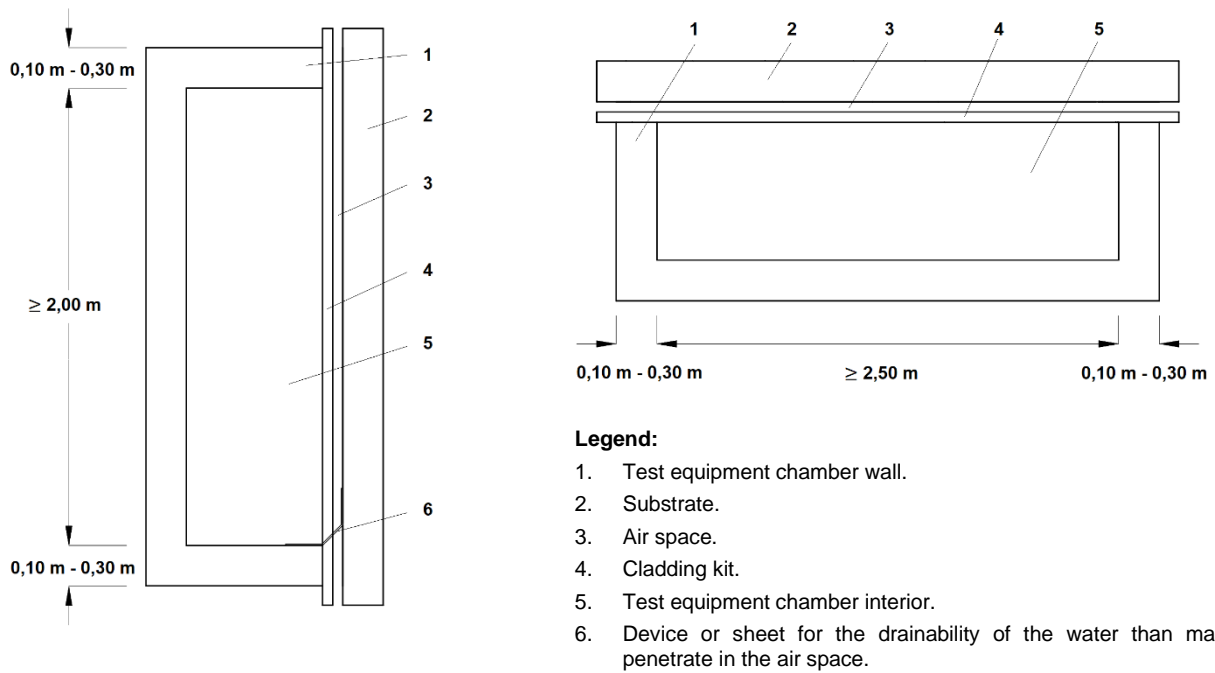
Schematic vertical cross-section of test specimen and test equipment.
